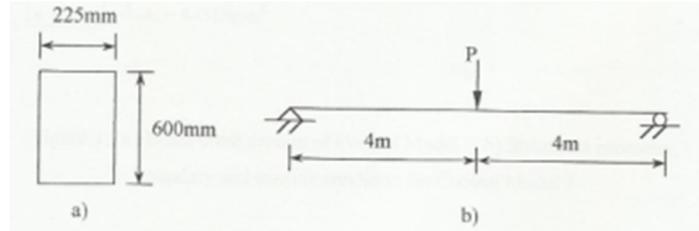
a) Beam cross section of control model 3, b) Structural boundary and loading condition for control model 3
